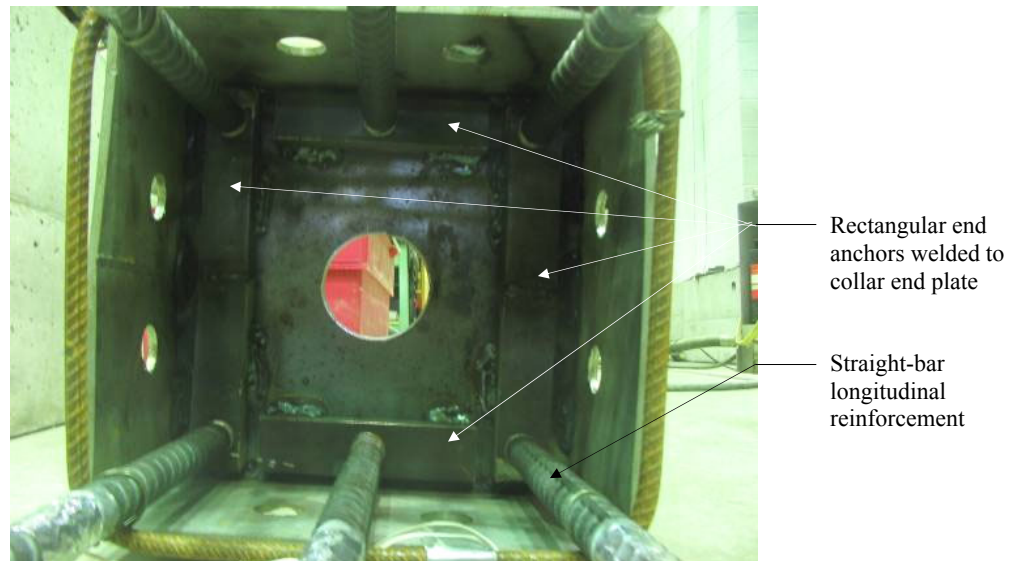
Photograph Column 5 collar reinforcement anchorages.
